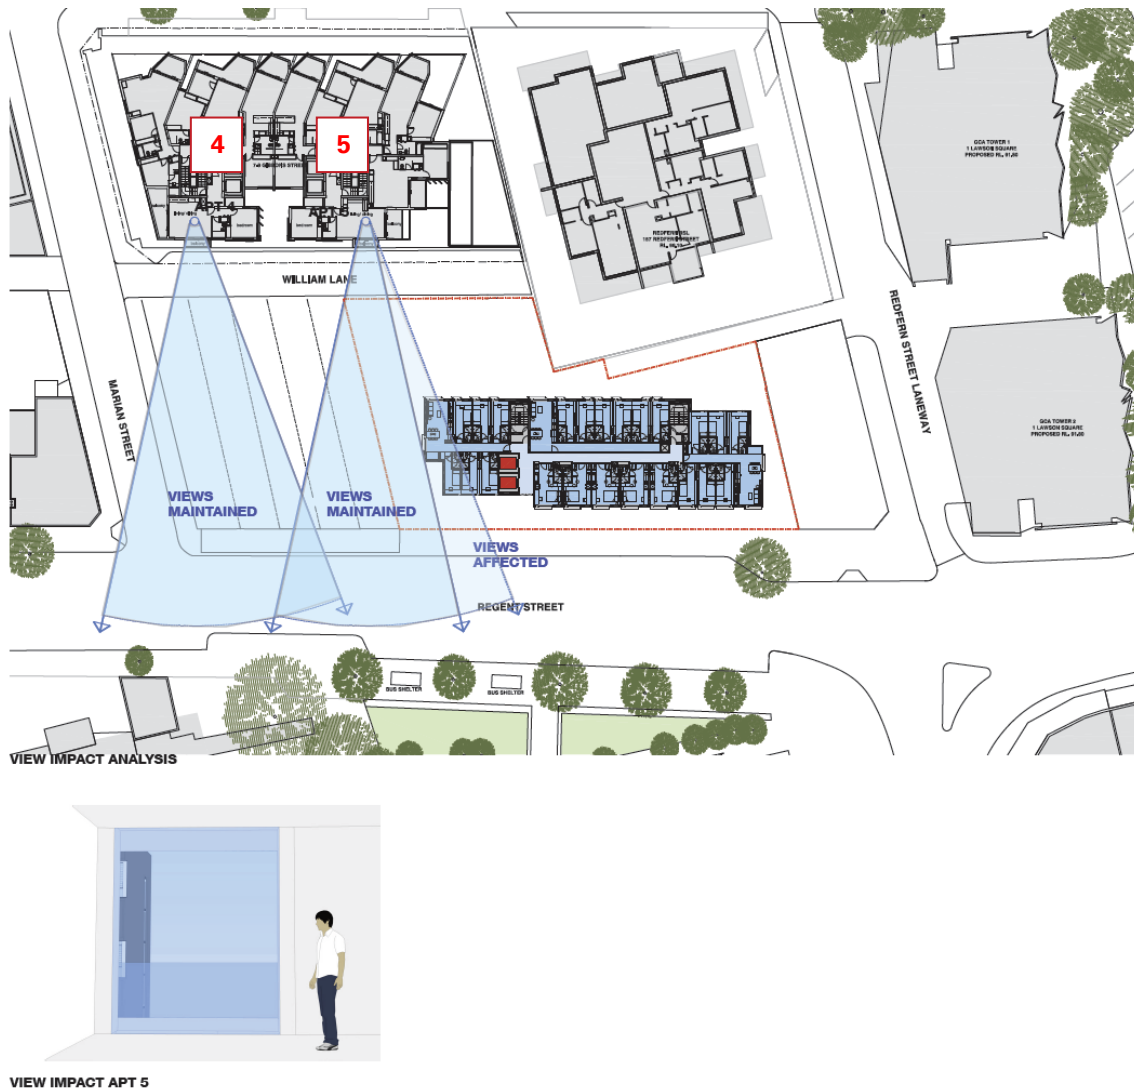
View impacts to dwellings within 7-9 Gibbons Street building
